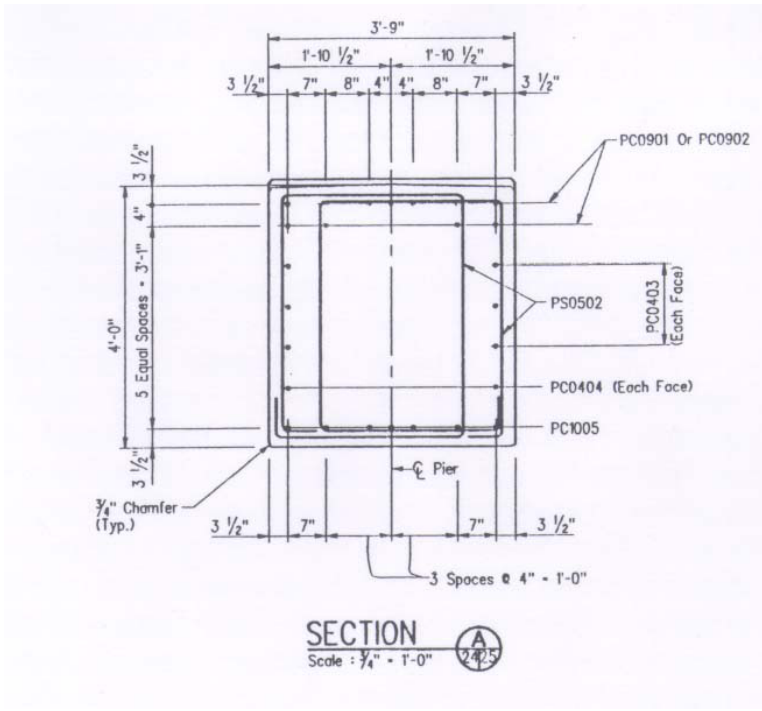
The actual cross section of the West Bound bridge pier cap beam [Brown, 1993].
